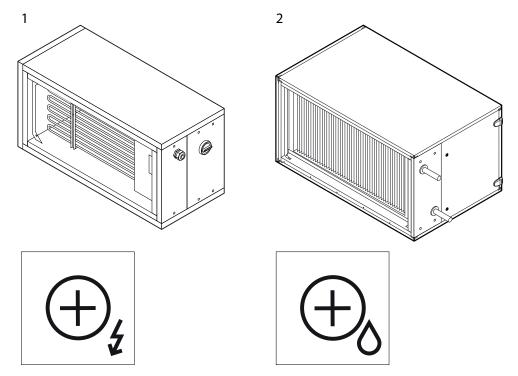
Heater section 1 – electric heater section and label, 2 – water heater section and label
